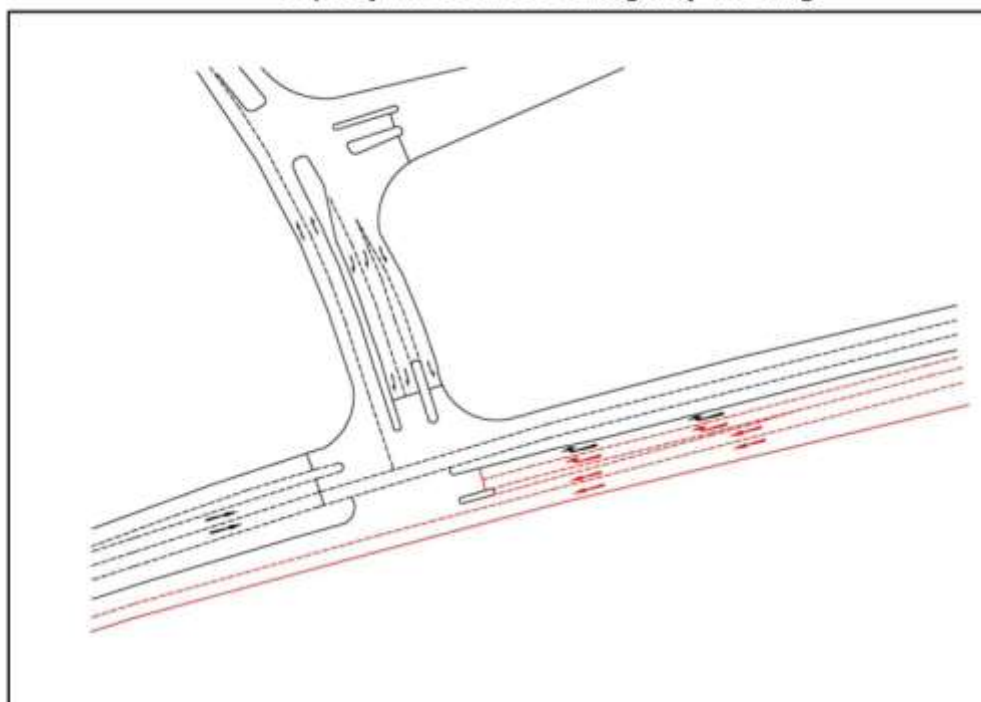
A2011 Crawley Avenue / B2036 Balcombe Road – Improved Right Turn Capacity and Localised Carriageway Widening
